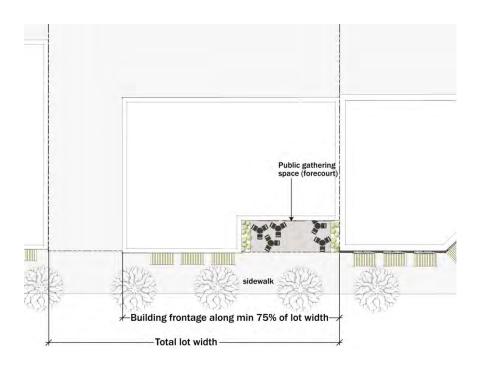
REQUIRED BUILDING FRONTAGE ALONG COMMERCIAL STREET AND PRINGLE CREEK
